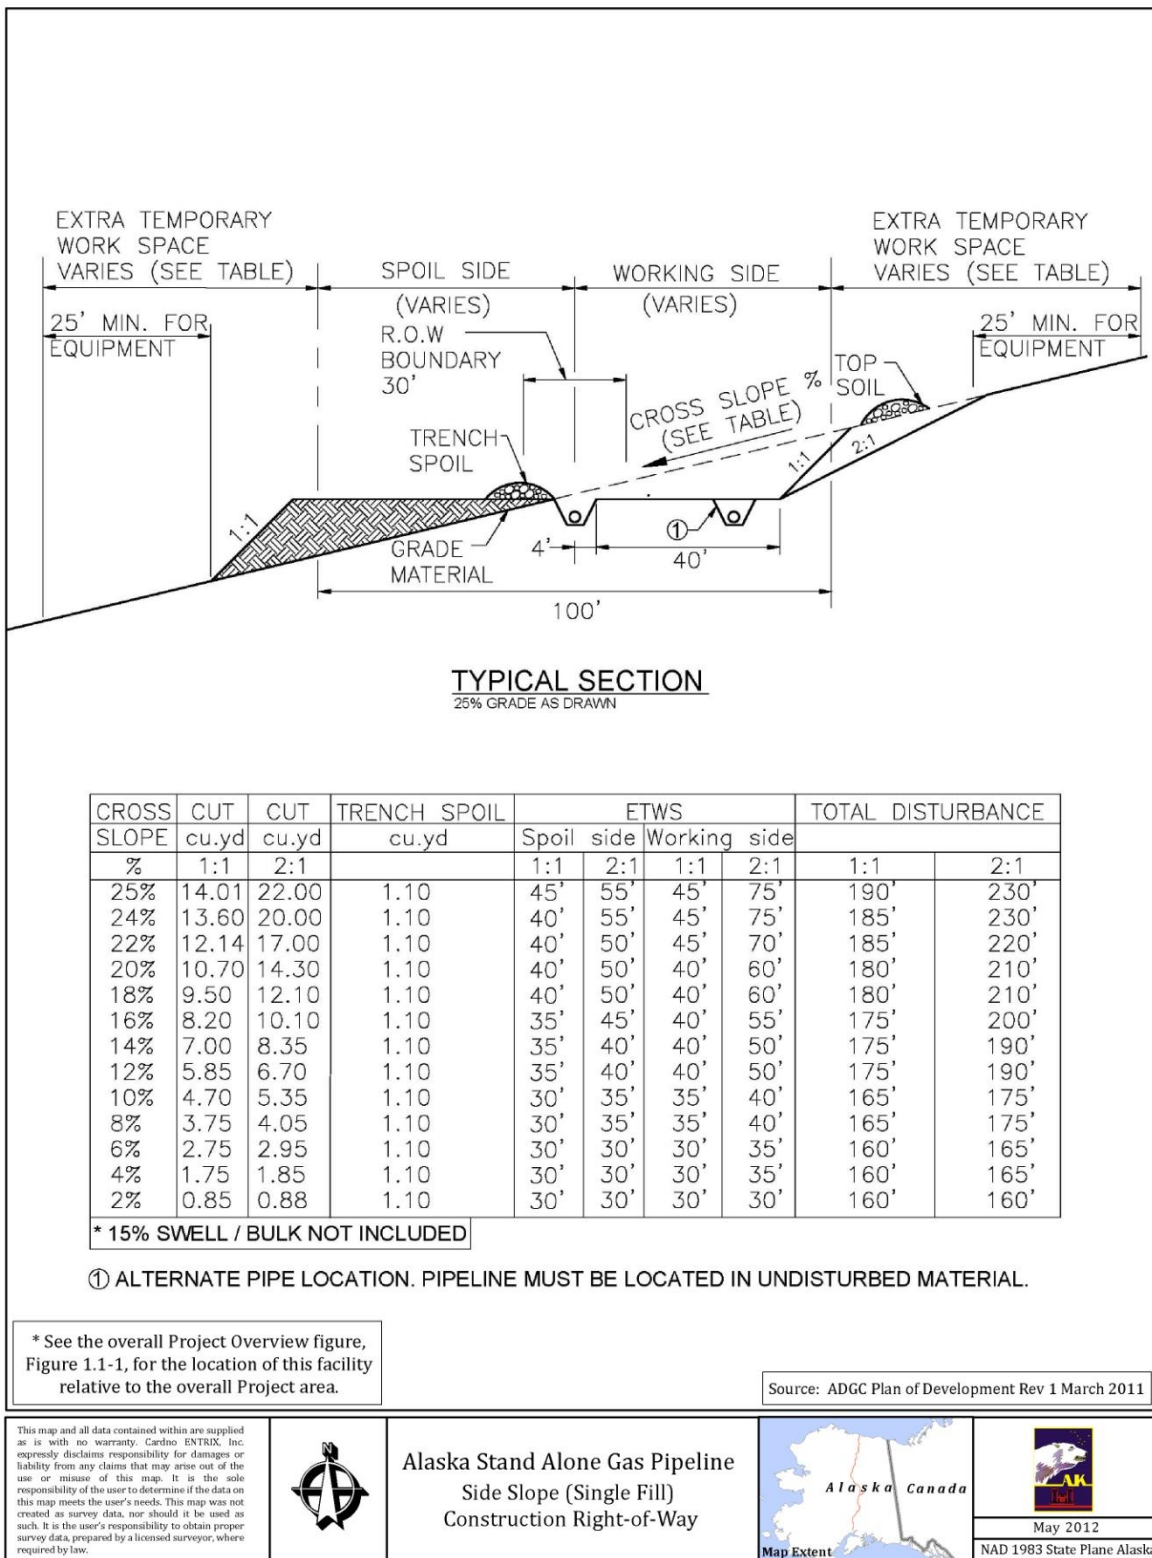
Typical Side Slope (Single Fill) Construction Right-of-Way
